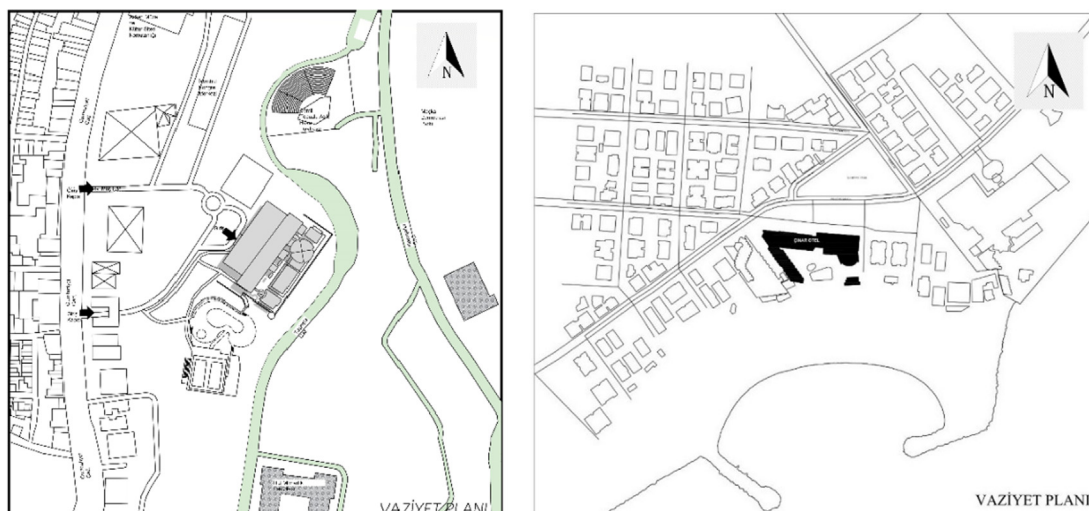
Site plans of Hilton Hotel and Cinar Hotel.
